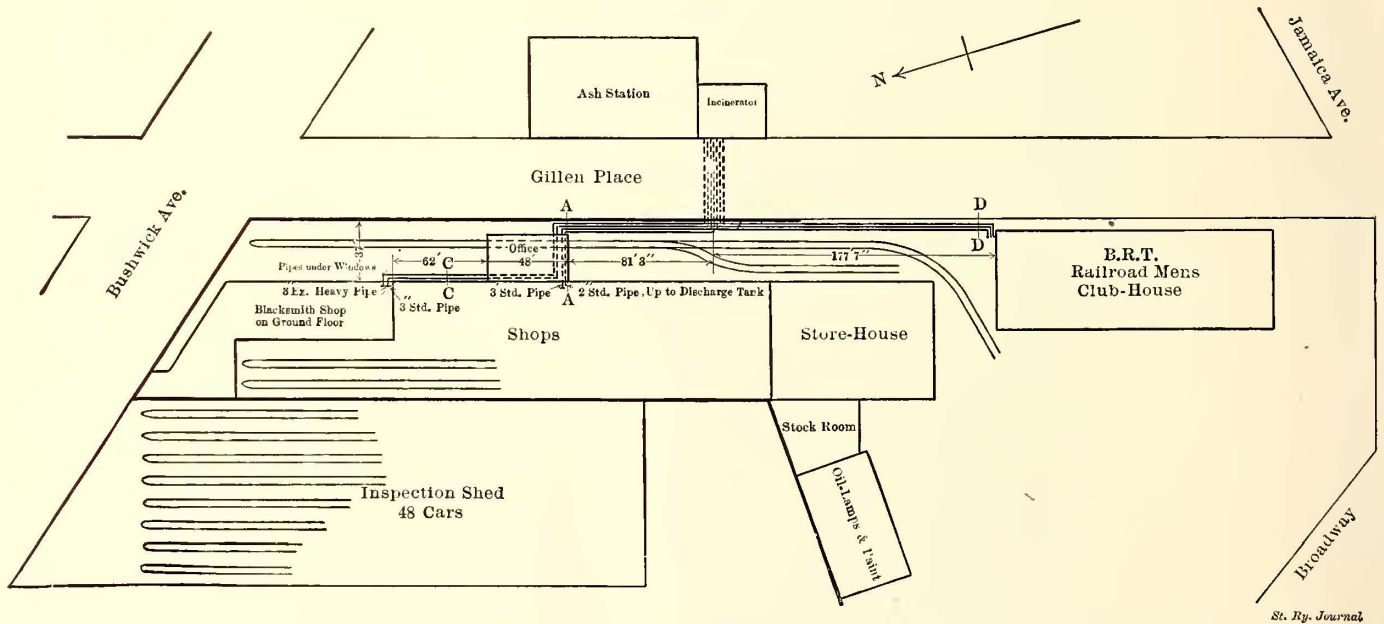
PLAN OF THE EAST NEW YORK SHOP AND YARD PLANT, SHOWING PARTIAL LAYOUT OF THE HEATING SYSTEM FROM THE INCINERATOR PLANT
